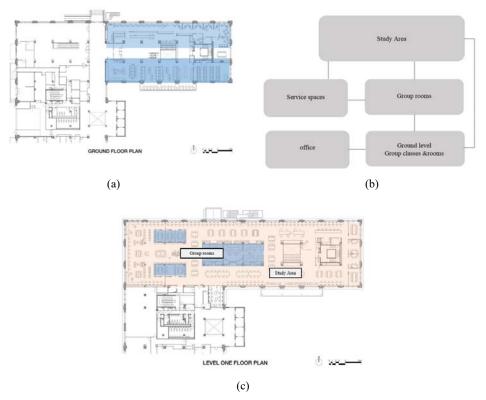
Raheen Library of Australia (a) floor- and first-floor plan, and (b) spatial diagram of floor-, and first-floor spaces
